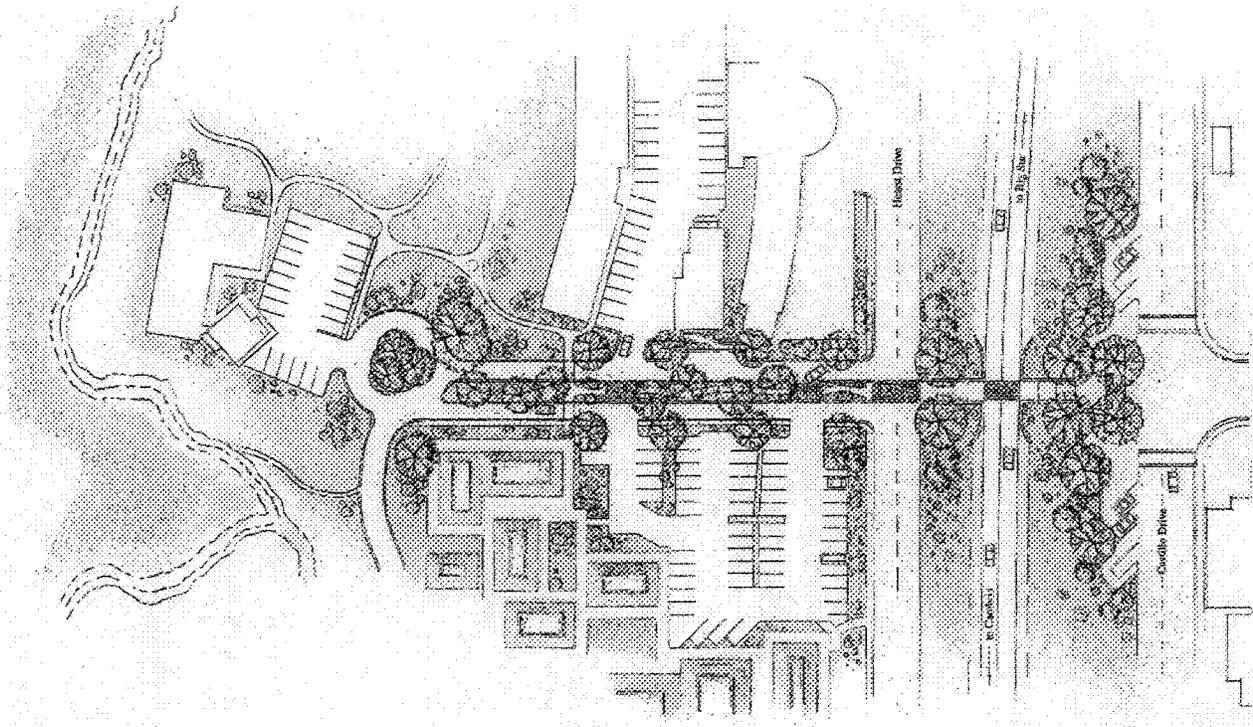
San Simeon Acres - Highway One Crossing Plan
